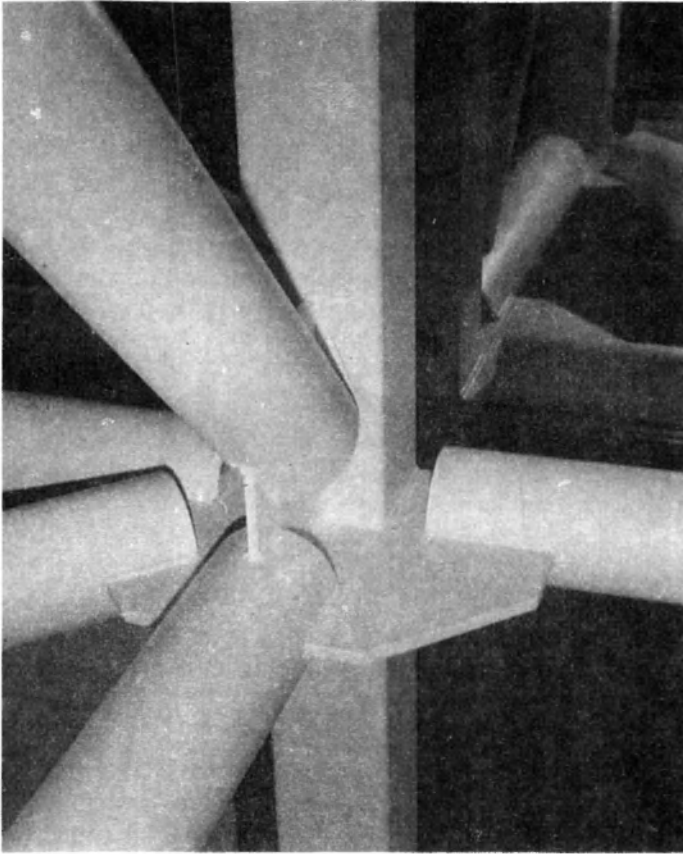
The knife-edge gusset shown here requires extra parts, more welding, and more blasting and painting.
